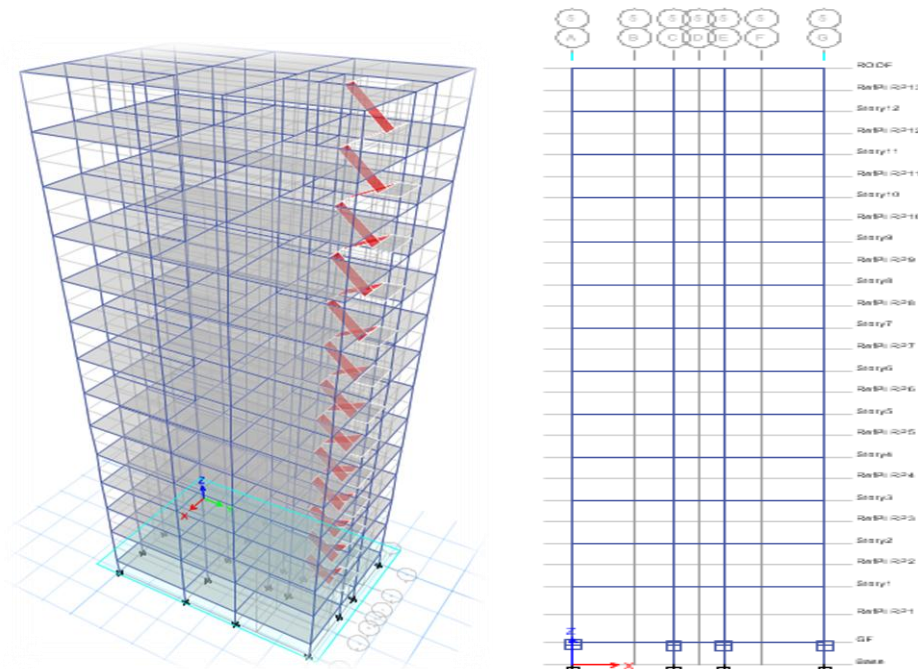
(a) 3D model and (b) elevation of 12 Storey RC building
